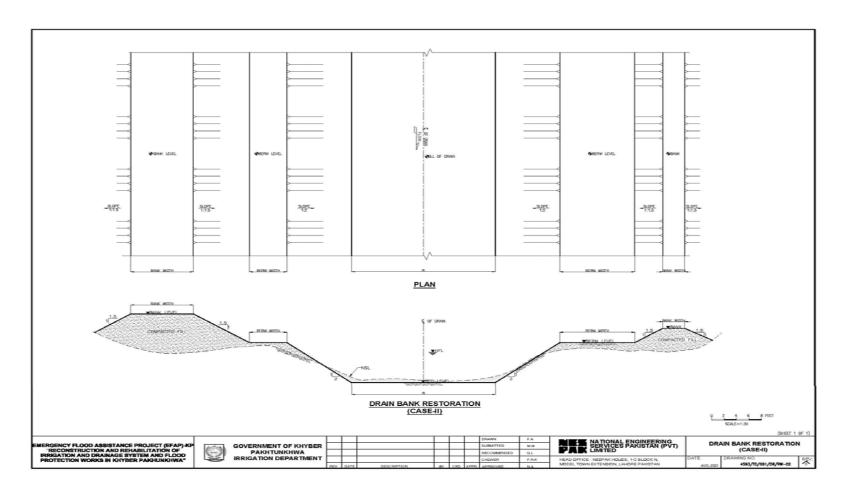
Typical Cross Section for Drain Bank Restoration
